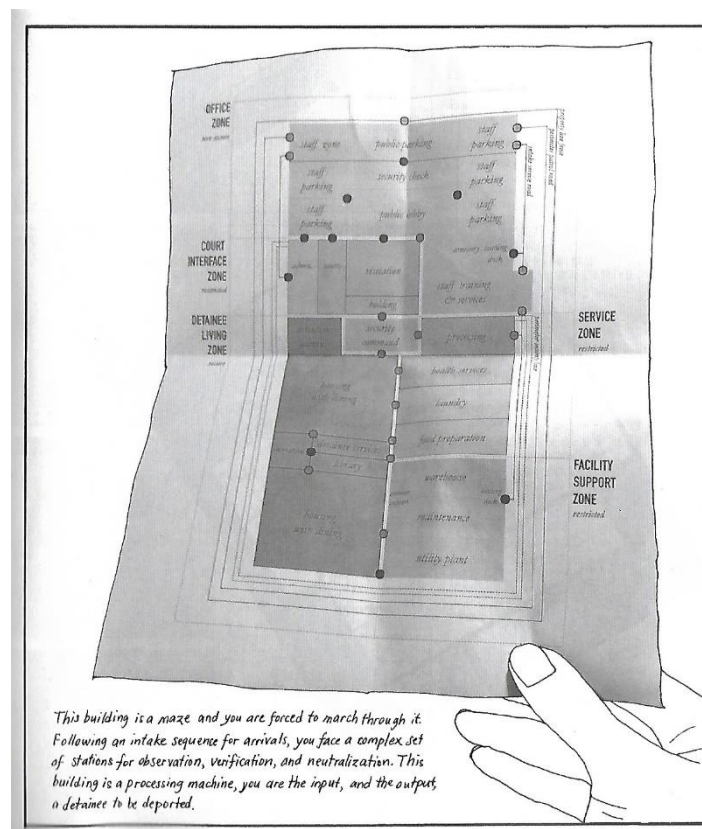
Hand holding photocopy of floor plan. (Chak 33)
